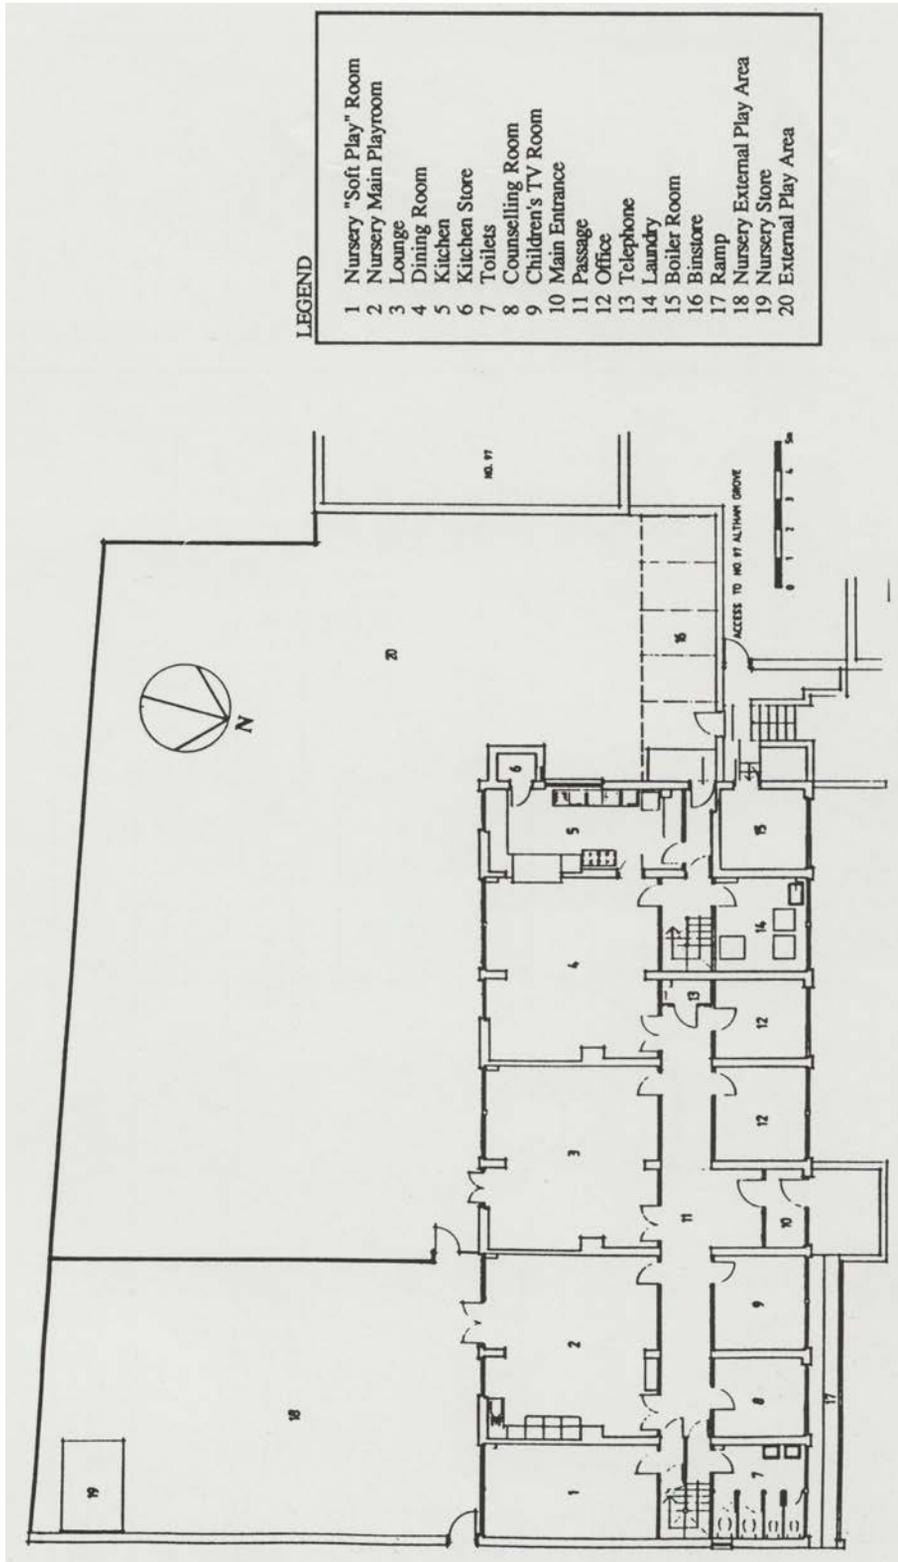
Existing ground floor plan, Harlow Women's Aid.
